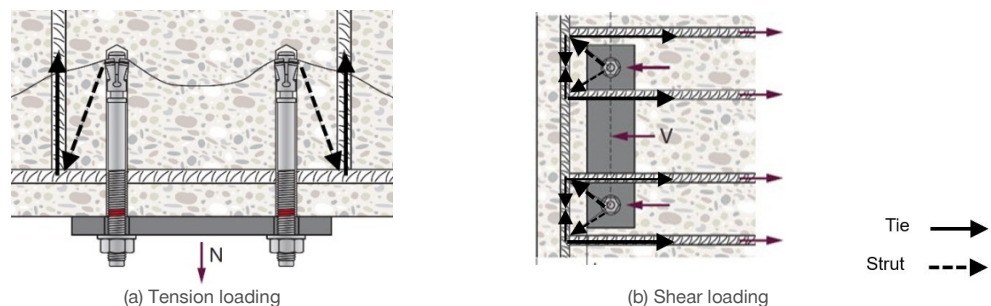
Supplementary reinforcement under tension and shear loading
